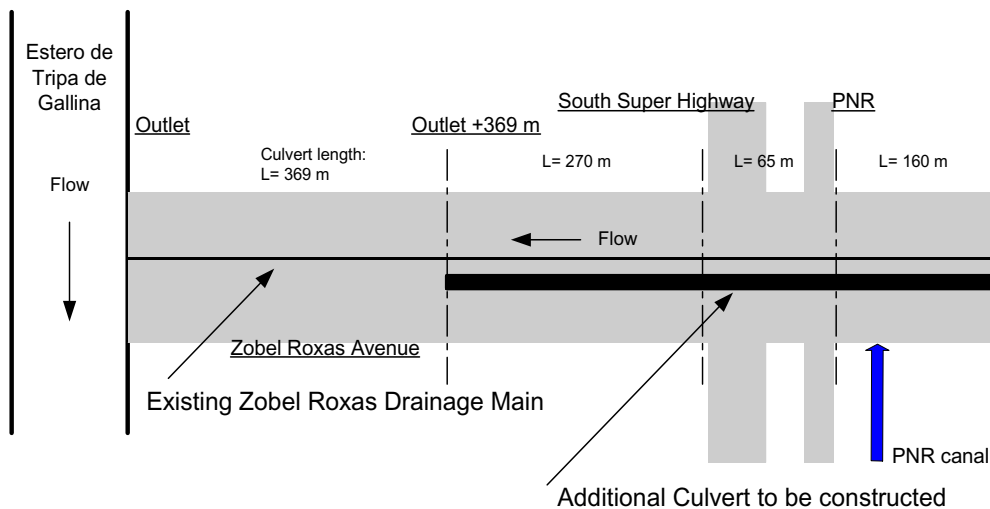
Existing and Proposed Routes of Zobel Roxas Drainage Main
